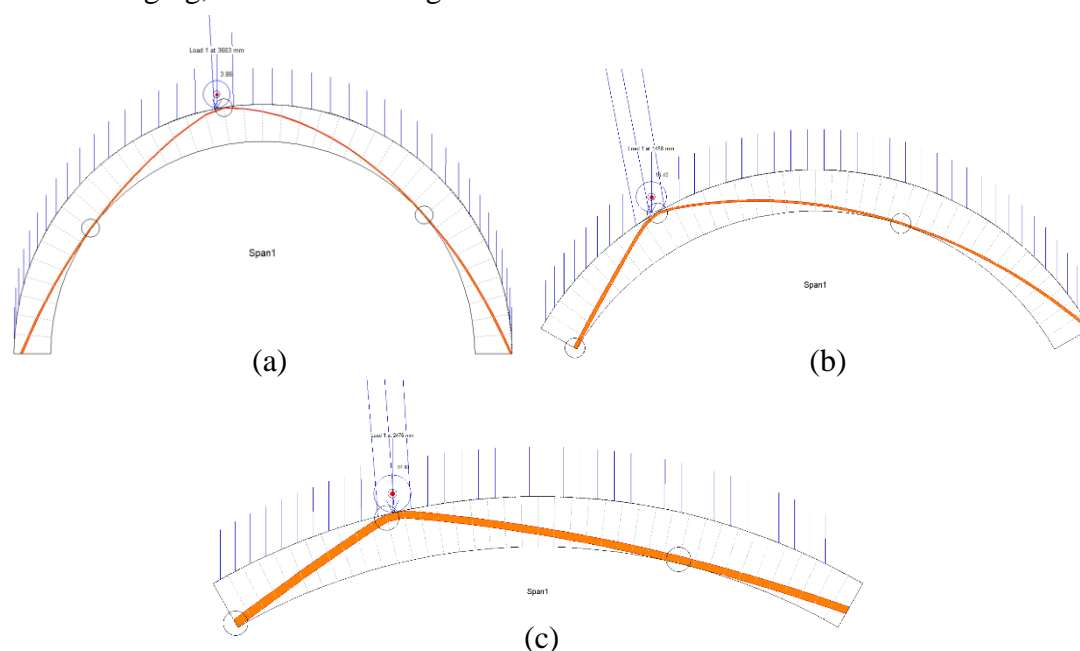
Failure modes: (a) semicircular arch: hinge mechanism; (b) 120° embrace angle arch: hinge mechanism; (c) 60° embrace angle: masonry crush
